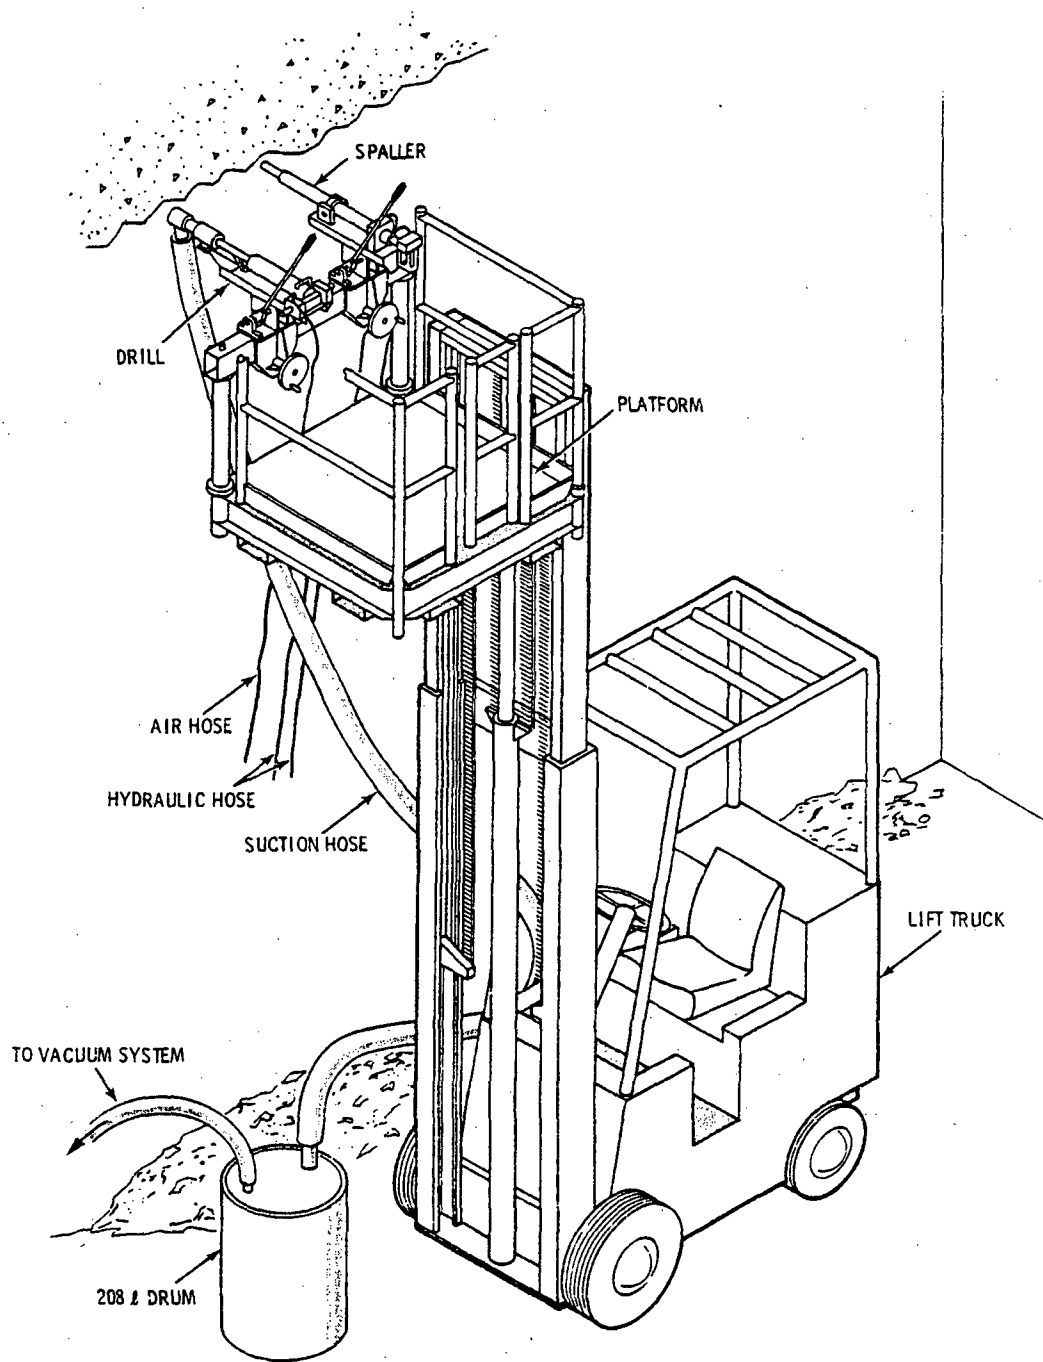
Mounted Concrete Drill and Spaller Unit
